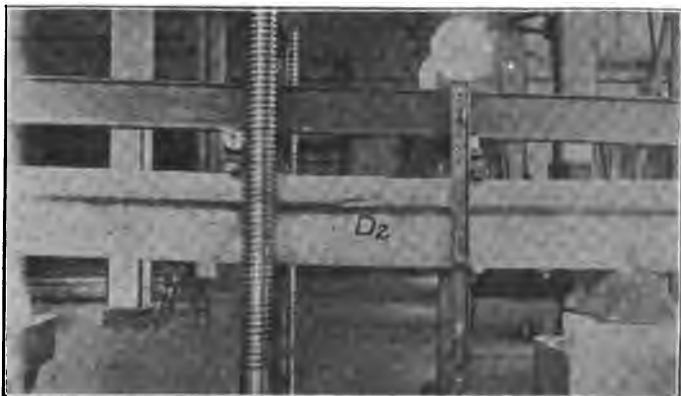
PLATE VIII.—FAILURE CRACKS IN BEAM C_2 AND TEE BEAMS A_1 AND D_2 .
